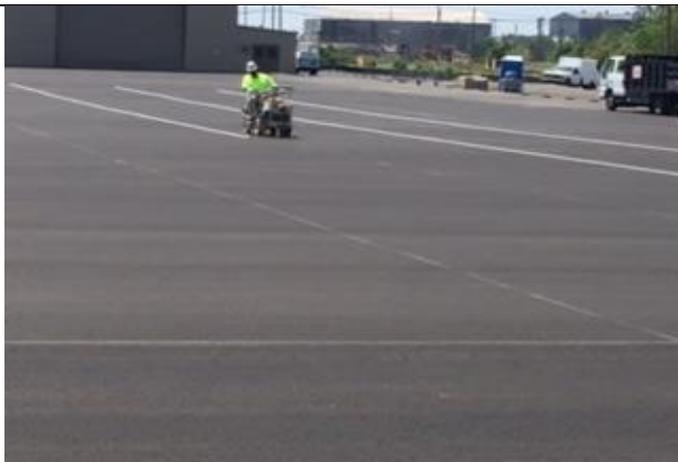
Striping and layout of the parking lot as approved by Pasha's layout.
